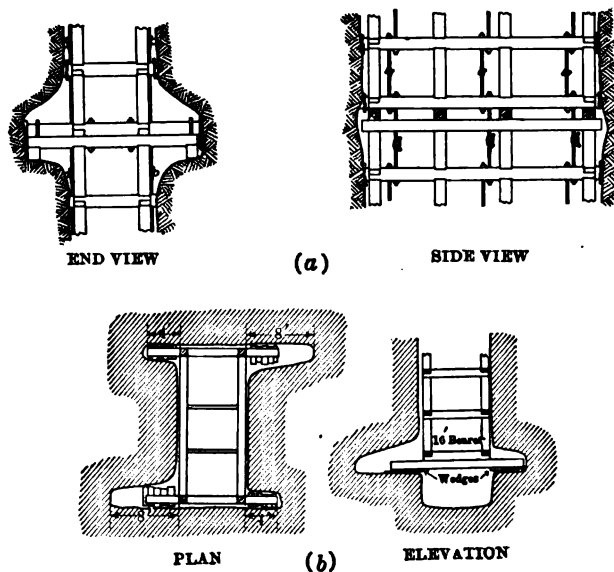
Construction of bearing sets. (a) (*Trans. A. I. M. E.*), (b) (*Bull. Minn. S. of M.*)
